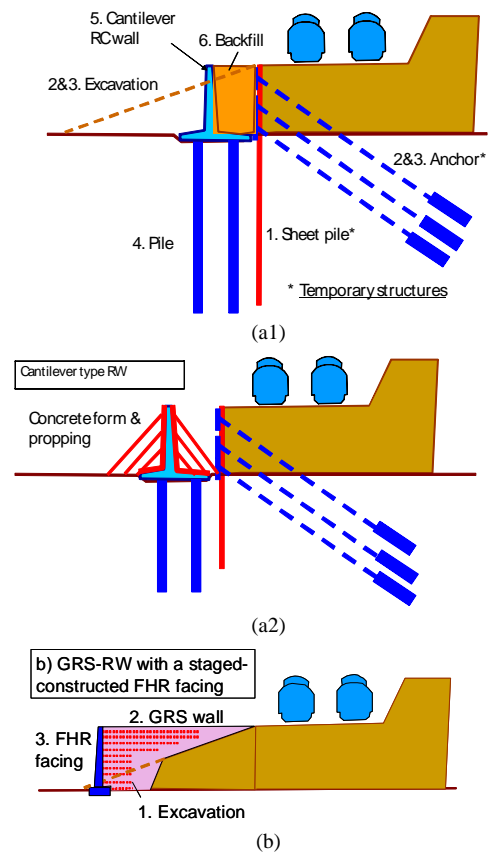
Reconstruction of a gentle slope of embankment to a vertical wall: (a1) and (a2) the traditional method; and (b) the new method (the numbers indicate construction sequence)
